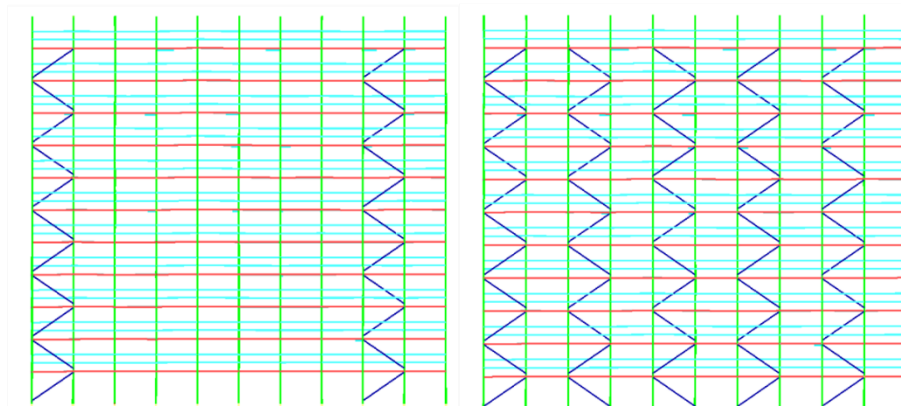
Modified bracing: poorly braced scaffolding (left) and stiffened (right)
